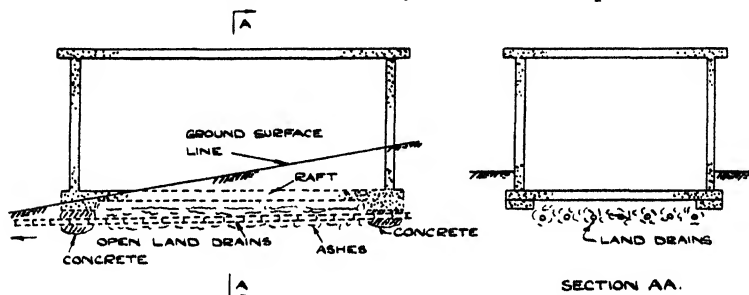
DRAINAGE TO SUBSOIL BY LAND DRAINS
